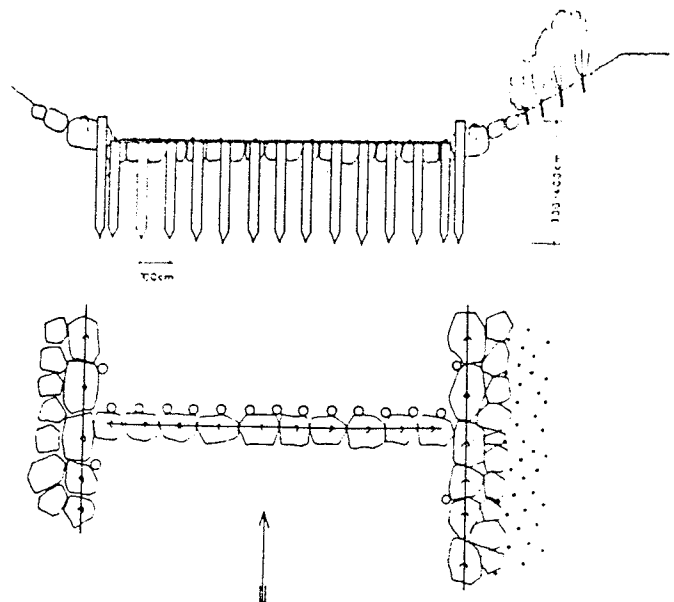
Flexible rock construction for bank stabilization and ground sills.
